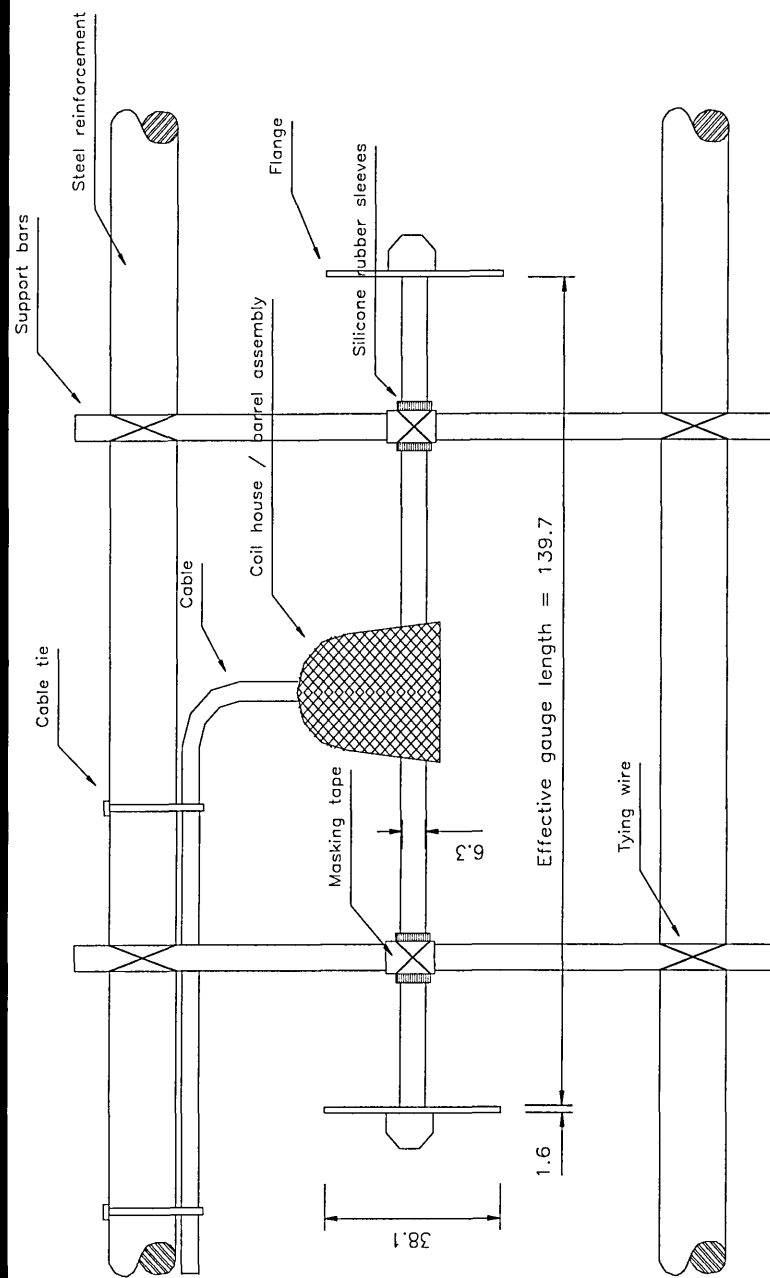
Measuring of repair material strain: embedment gauge attached parallel to the steel reinforcement
